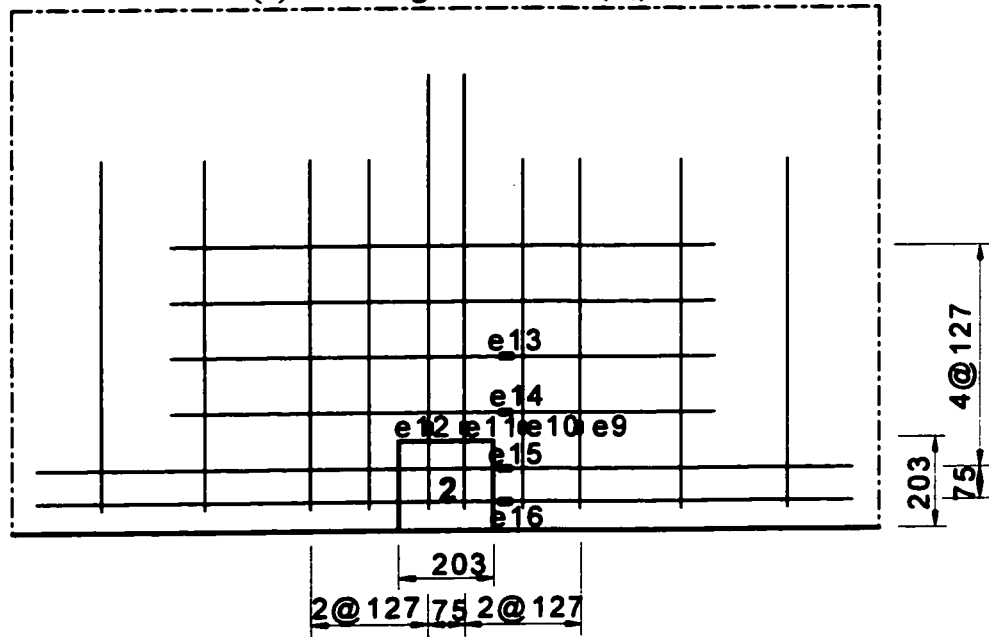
Test setup for edge column slab connection of the continuous slab specimen subjected to vertical load only
